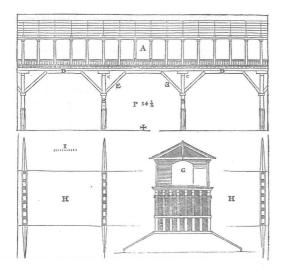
The Brenta bridge in Bassano. Palladio 1570. 3: 20
